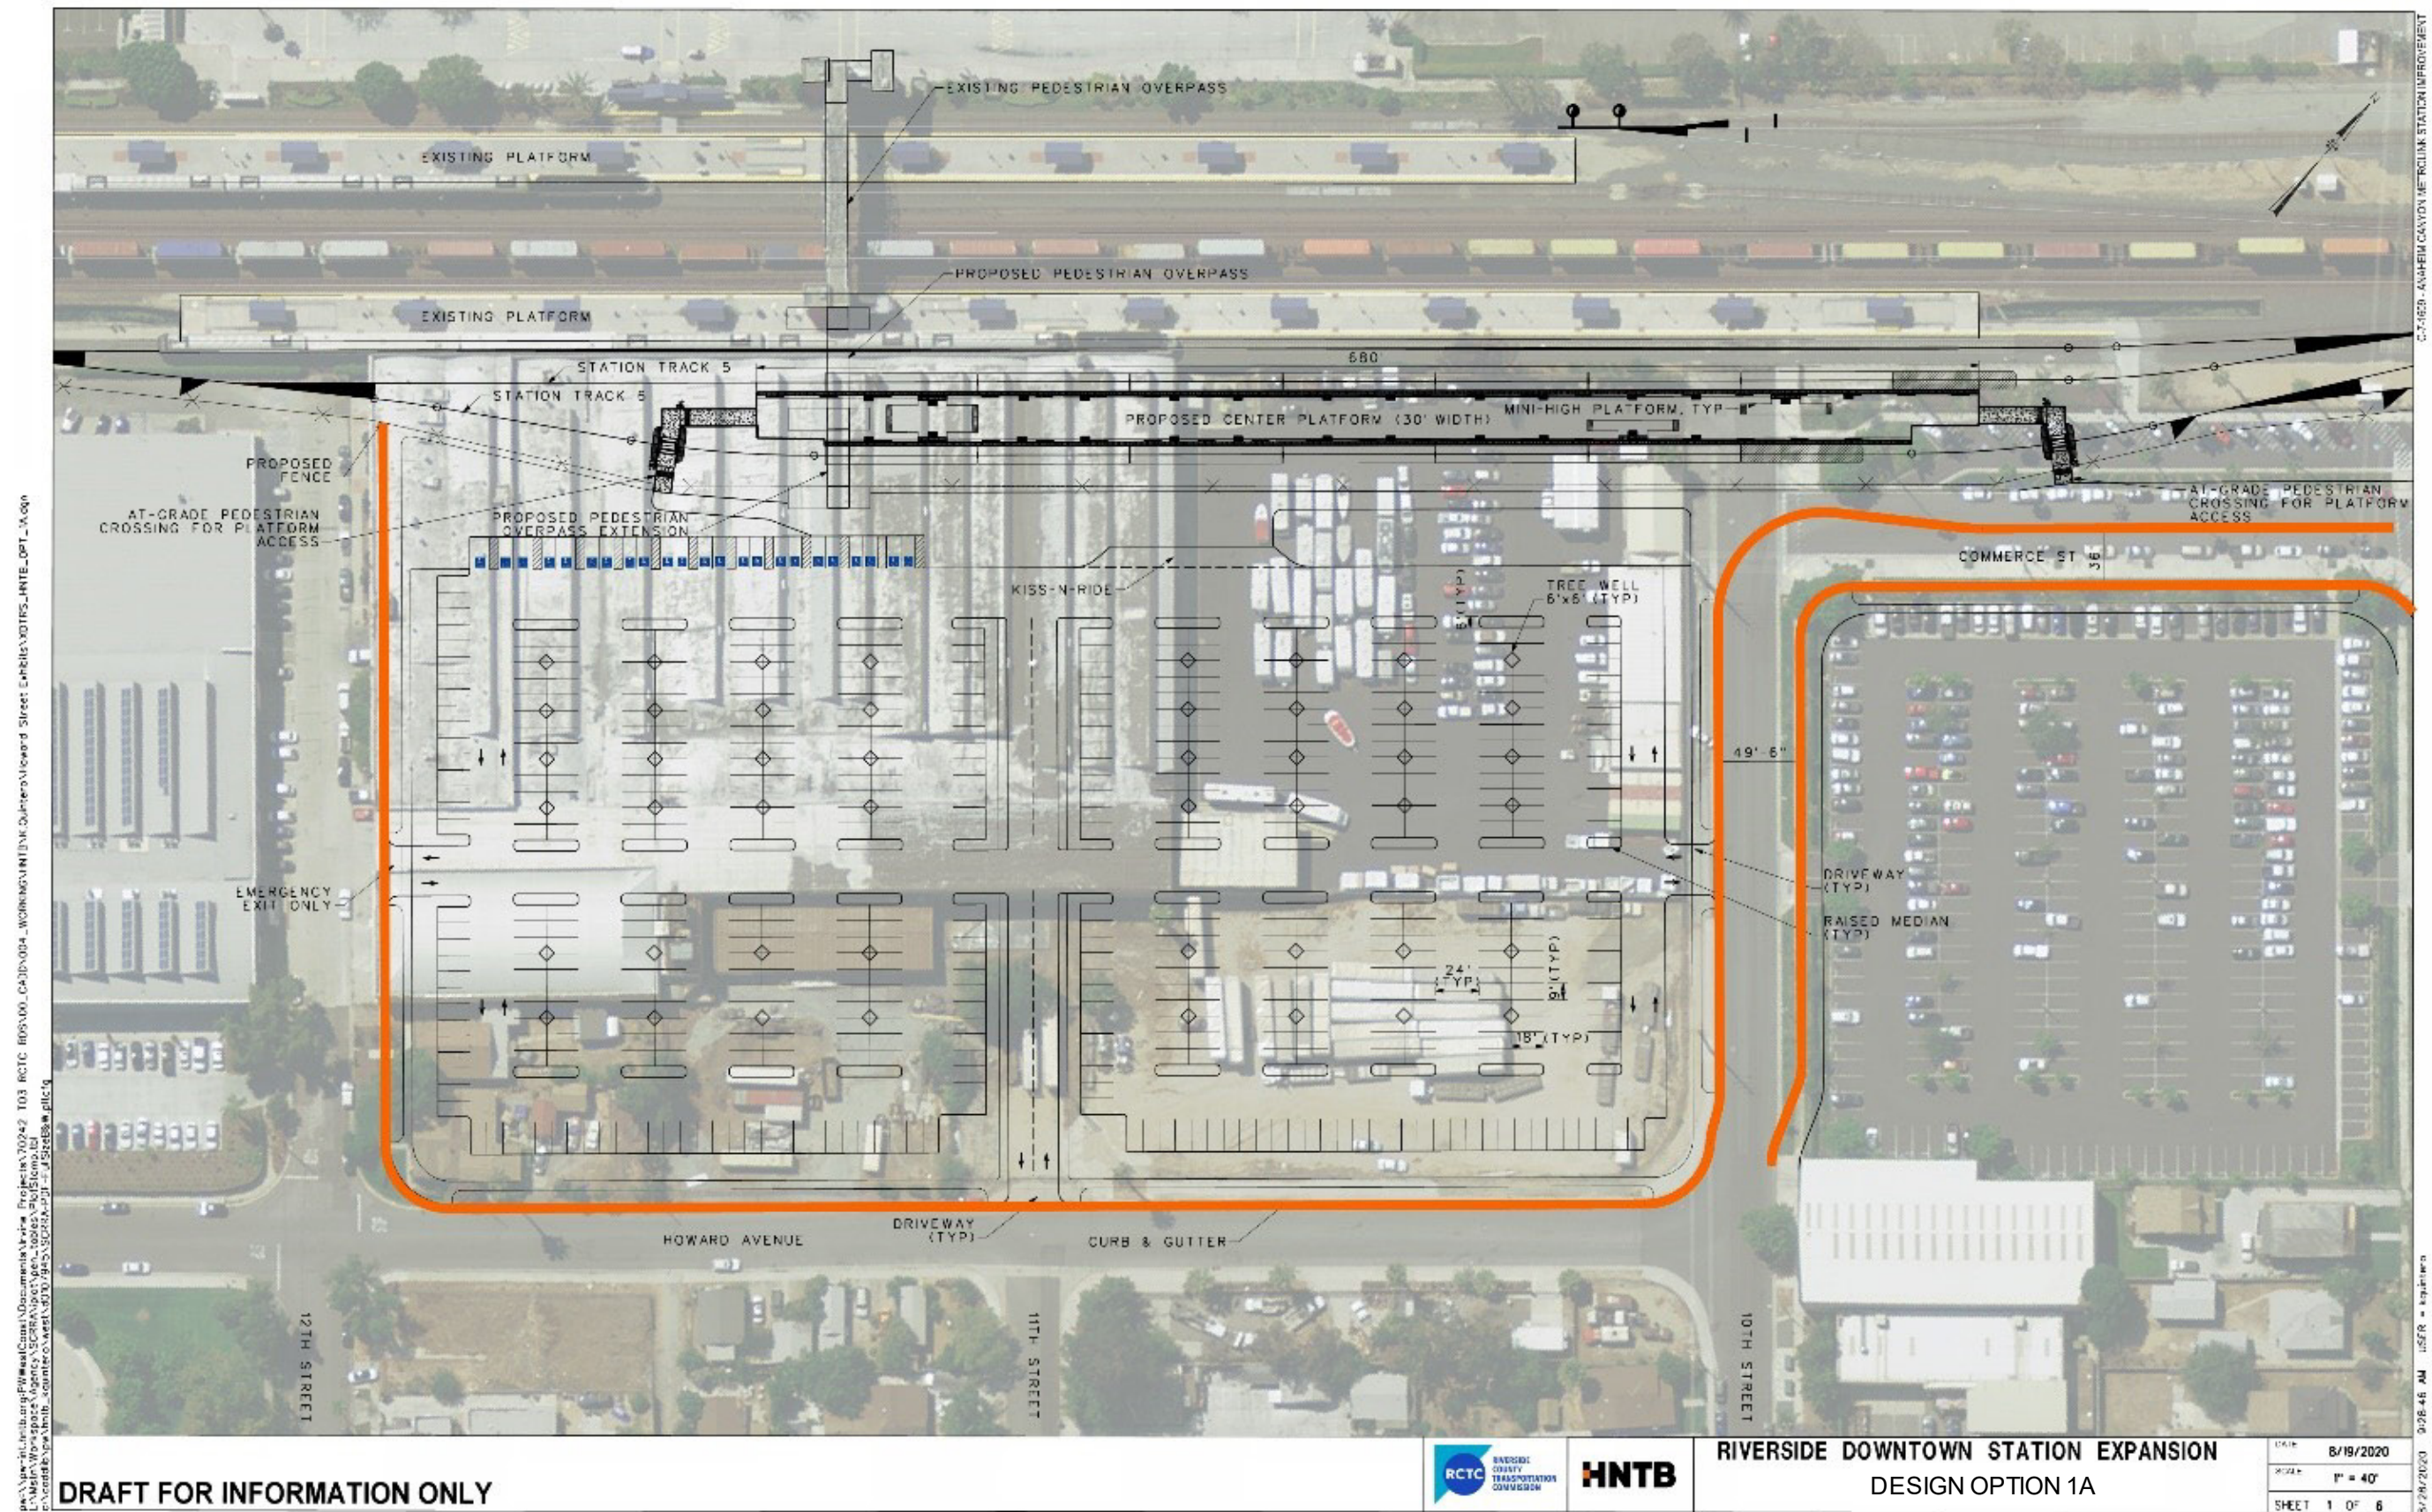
Build Alternative with Parking Design Option 1A
